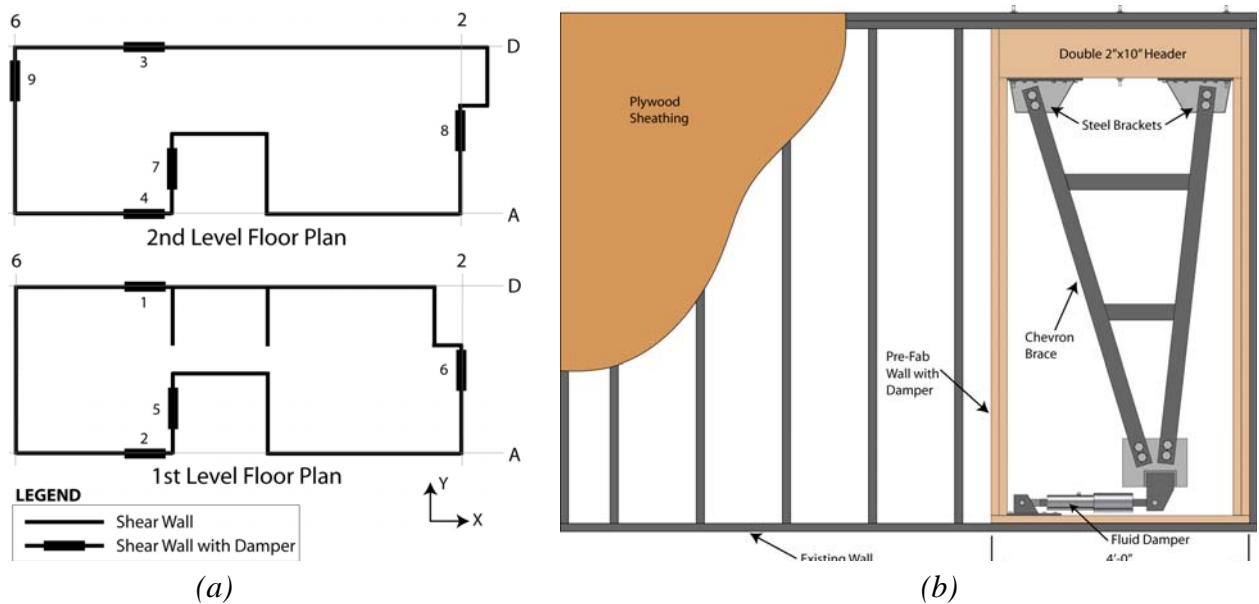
(a) Plan view of 1<sup>st</sup> and 2<sup>nd</sup> floor levels showing location of dampers and (b) Schematic of typical retrofitted shear wall
